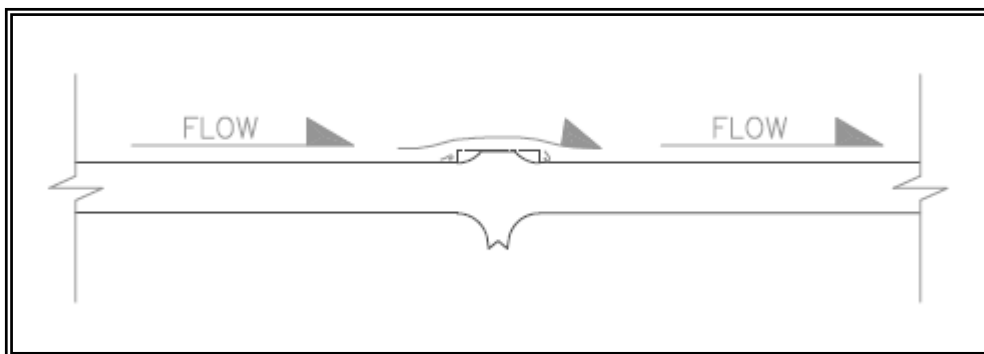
Hydraulic Representation of Fusion Joint with Bead Removed
